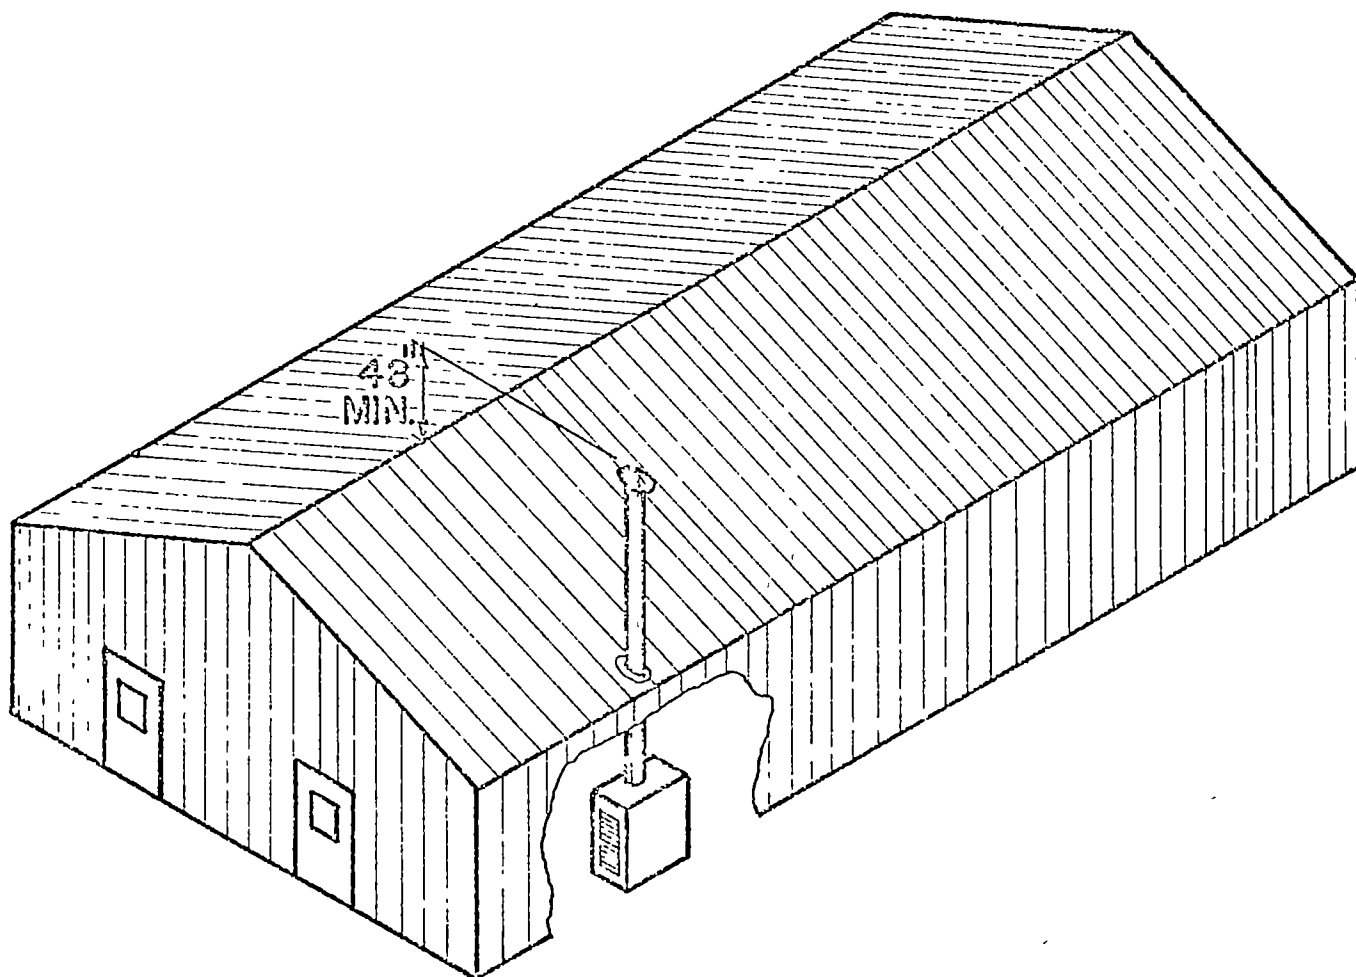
ALL GREENHOUSE HEATING UNITS SHOULD BE VENTED TO THE OUTSIDE. TOP OF VENT STACK SHOULD BE AT LEAST 48" ABOVE THE ROOF PEAK.
